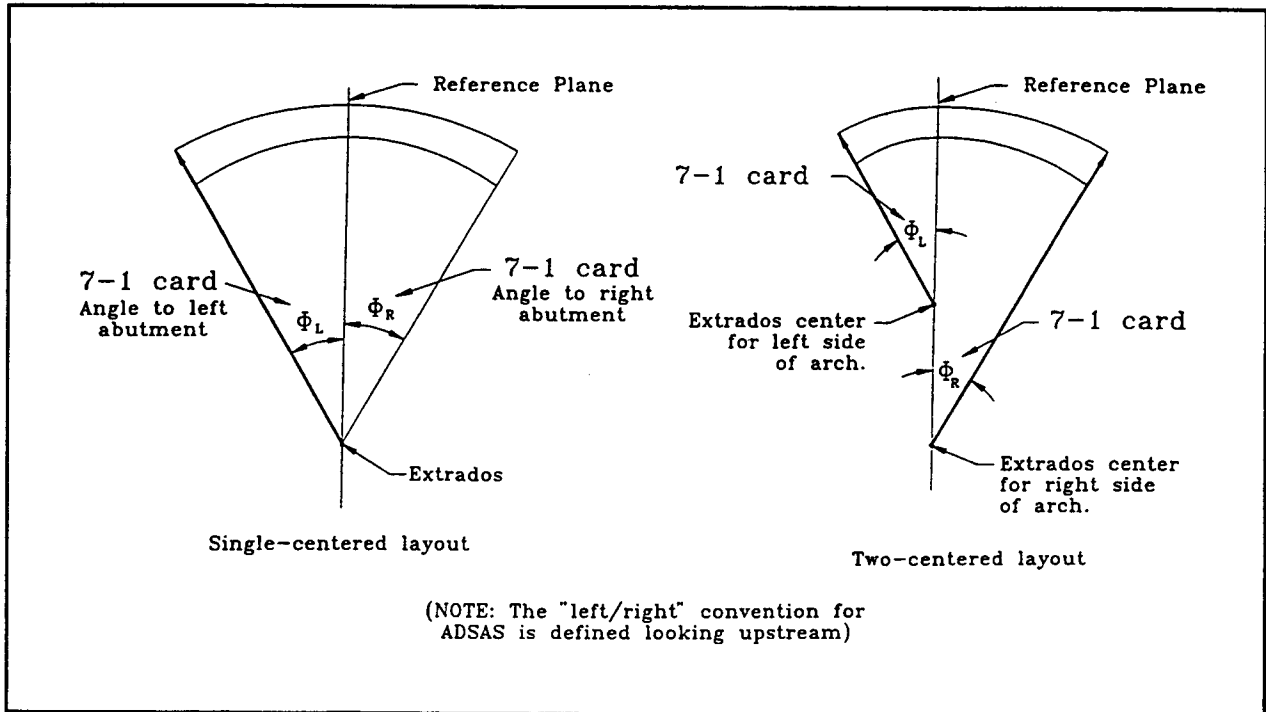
Plan view of angles to the abutments for single-centered and two-centered layouts
